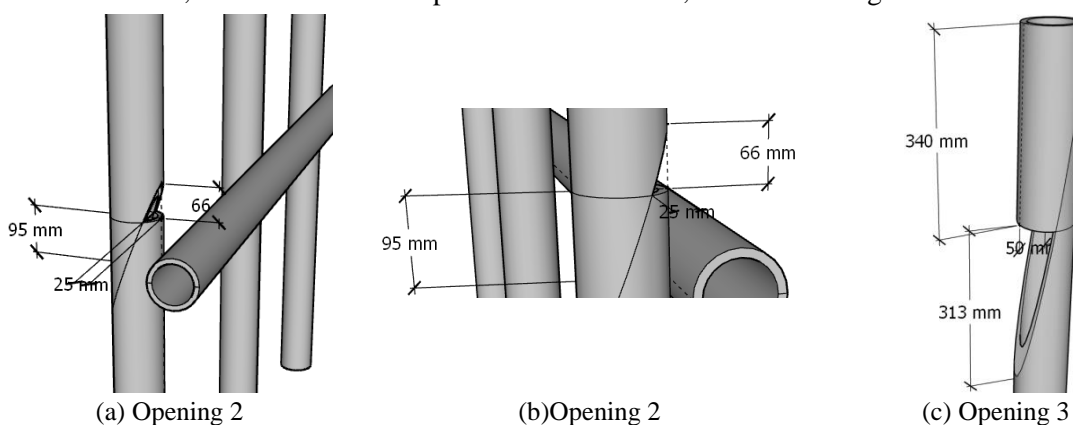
Dimensions of Openings 2 and 3 of the bamboo frame.
